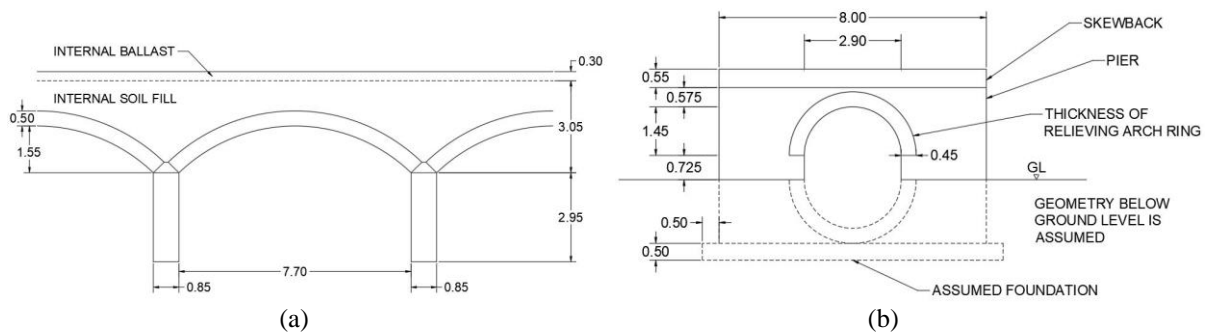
(a) main span elevation, viewed along the global transverse direction, and (b) pier elevation, viewed along the global longitudinal direction, views of Marsh Lane viaduct (with key dimensions in metres).
